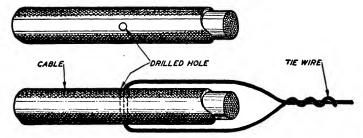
Method of Attaching Pulling-In Rope to Large Cable
